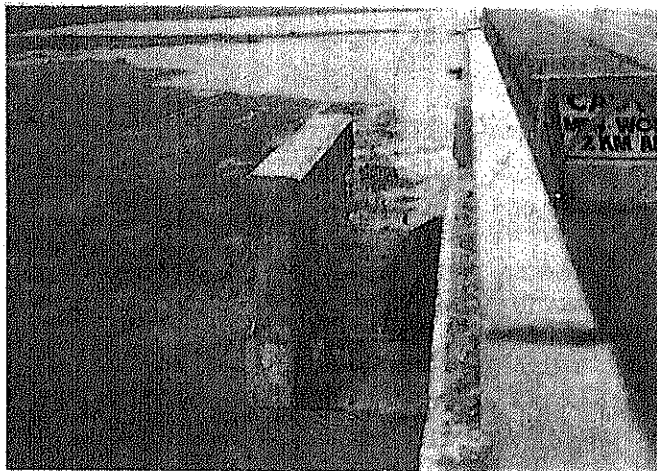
Lateral slip of floor slab of elevated bridge of North Super Highway; A close up view of the lateral slip
